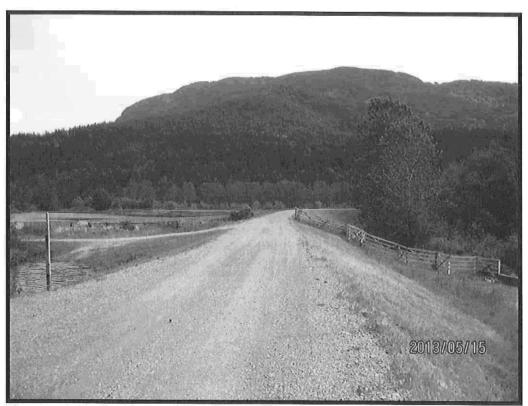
Looking northwest at Dike C from Station 53+00 (Limbert Road). (May 15, 2013)
